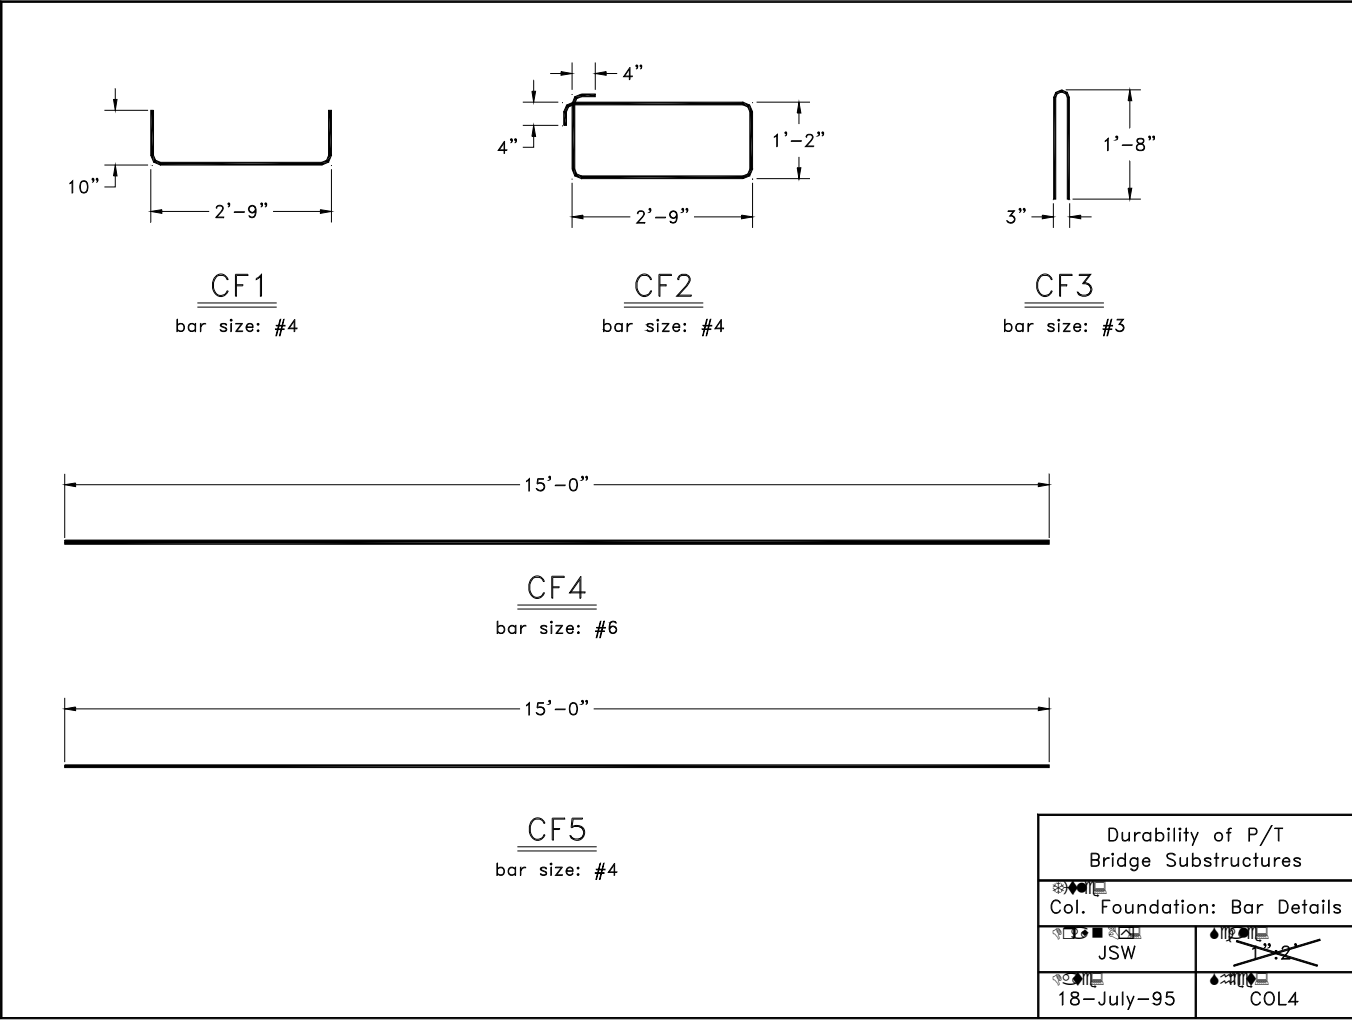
Sheet COL4: Column Foundation Bar Details
